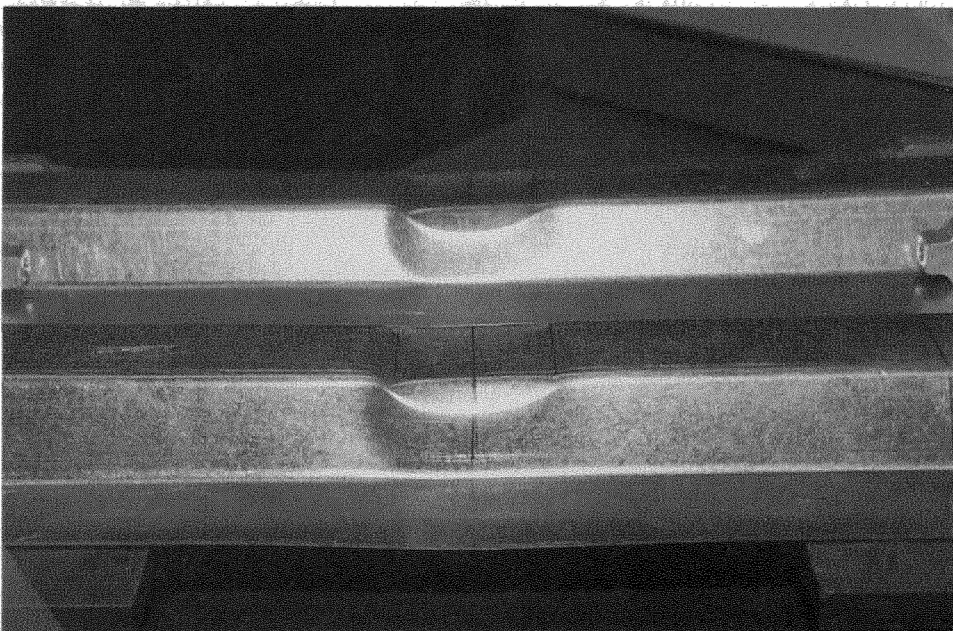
Local Failure of Specimen after Test in IOF Condition
